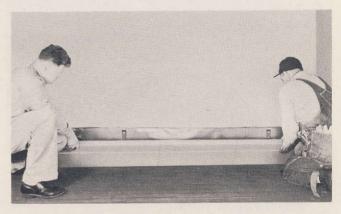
After assembled baseboard is in position, sealing strip is lapped over top.
